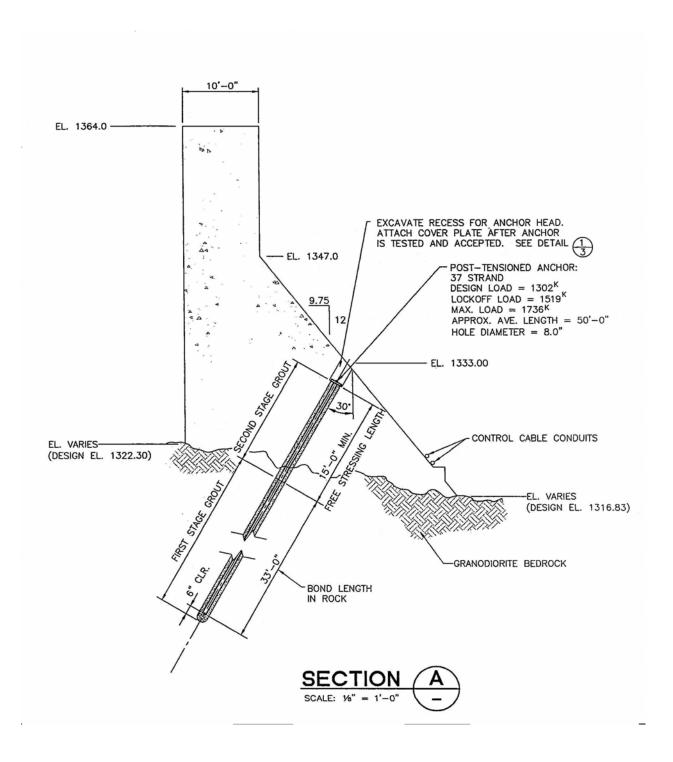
Intake Section, Penstocks & Powerhouse Not Shown
